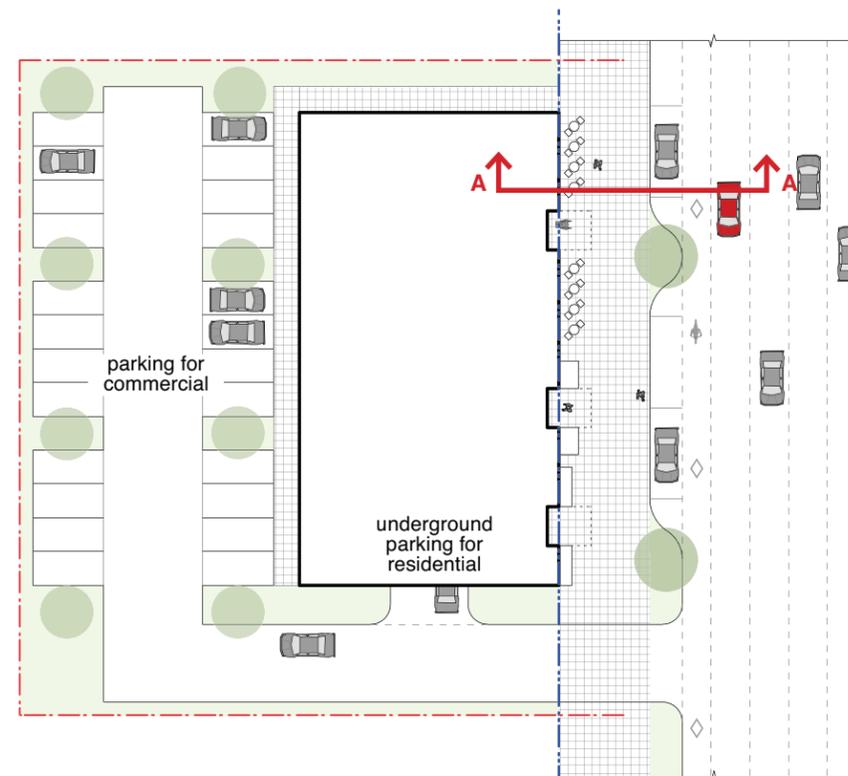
SAMPLE SITE PLAN (not to scale)
